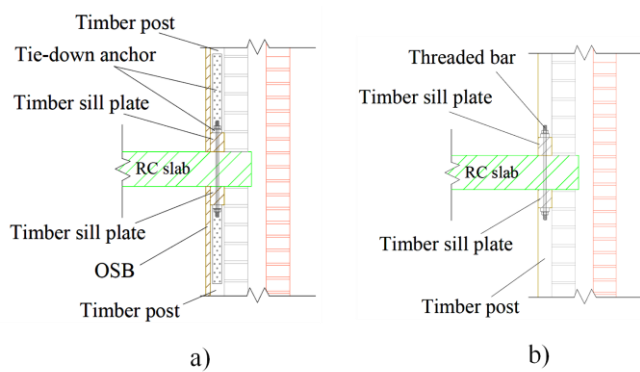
Sill plates-to-RC slab connections details: a) transverse sides (North, South); b) longitudinal sides (East, West).
